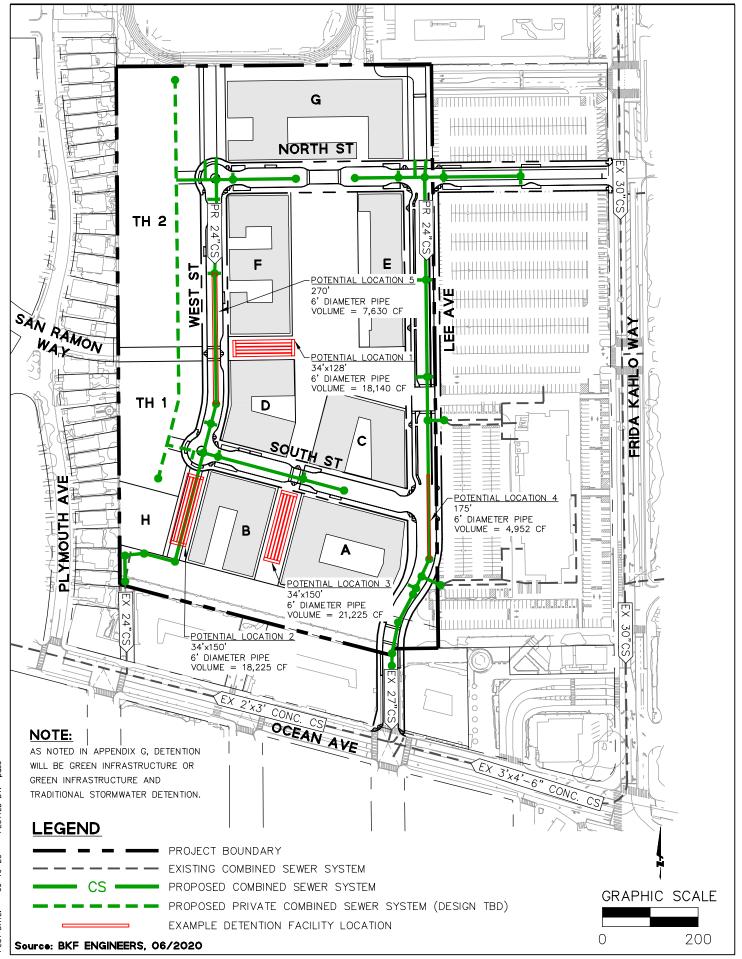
EXAMPLE STORMWATER DETENTION ALTERNATIVES
